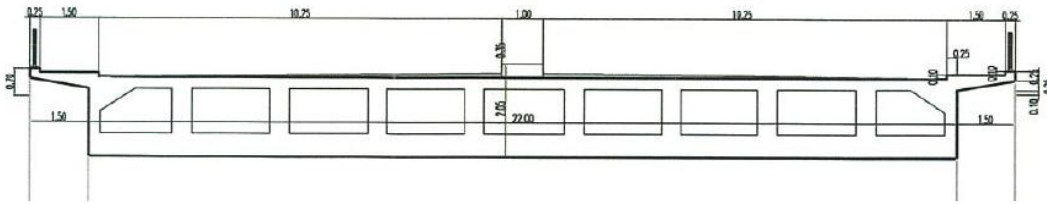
Cross section of arch slab near the fixed ends (section 4-4)
